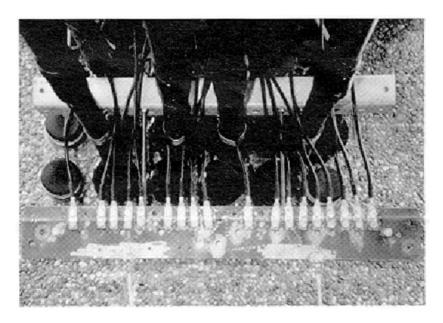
Lightning protection grounding clip connected to outdoor grounding bar
